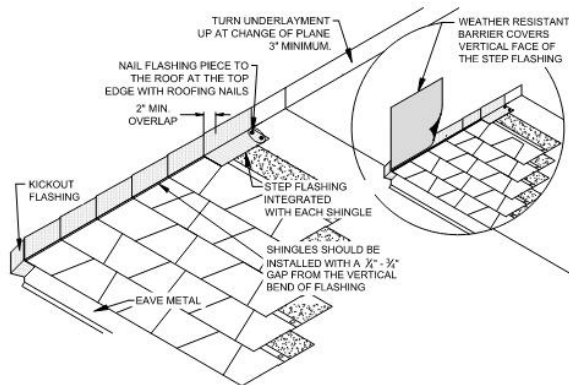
Step Flashing Application at Roof-to-Sidewall Transitions
